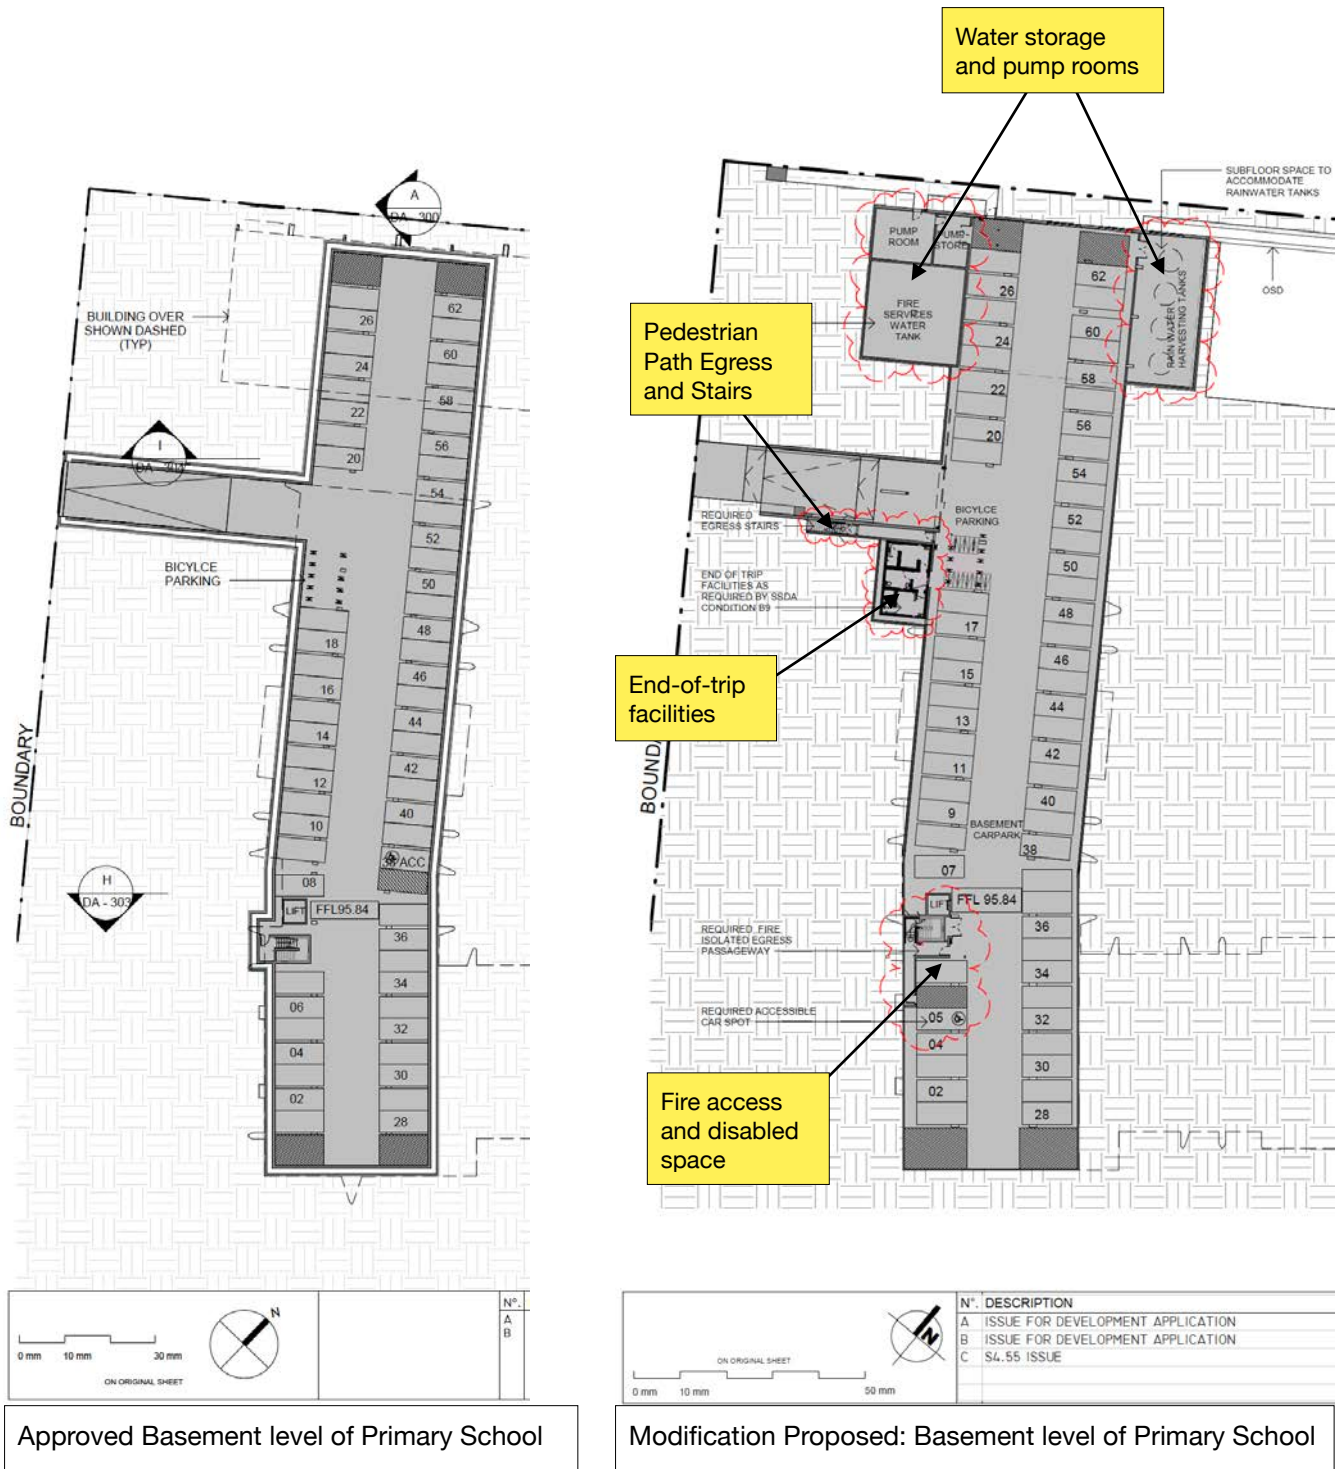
(above): Revised basement car park level of Primary School under SSD 9227 MOD 1 compared to original approved DA plan. The changes proposed, for water storage, pump rooms, access and end-of-trip facilities, are in response to the requirements of Conditions B9, B10 and C20 of the consent. (changes highlighted by a revision cloud).
